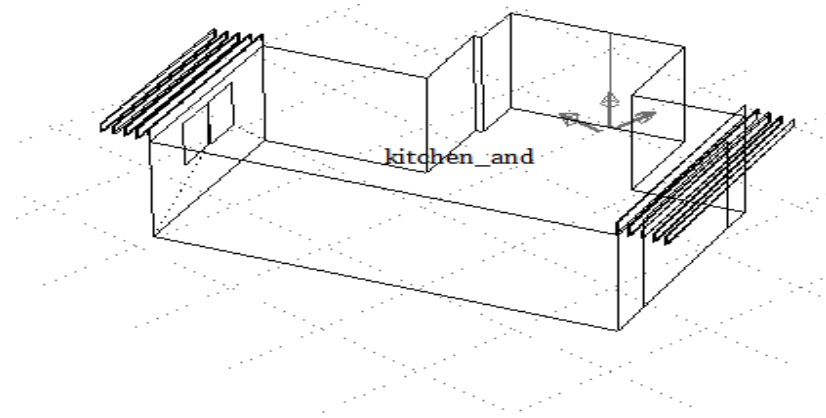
IMPROVED MODEL OF KITCHEN AND DINING HALL IN CRAIGROTHIE PASSIVE HOUSE
